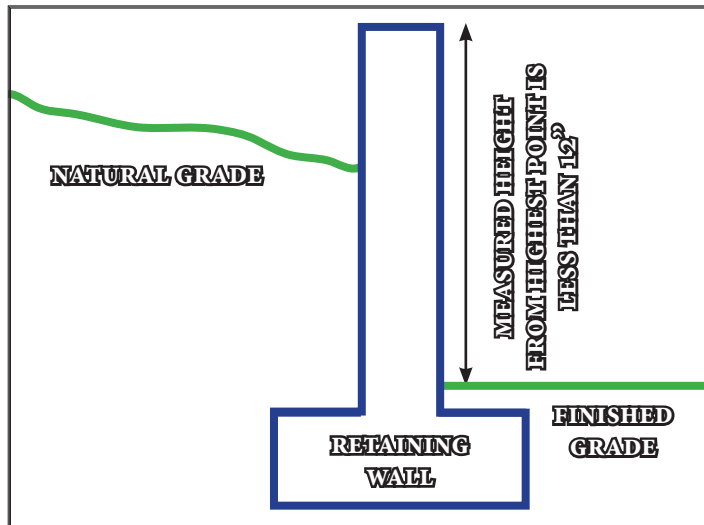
The height of a retaining wall is measured from the highest point of the retaining wall to the finished grade. Any retaining walls 12 inches or less will not require a CoA or ACoA.
